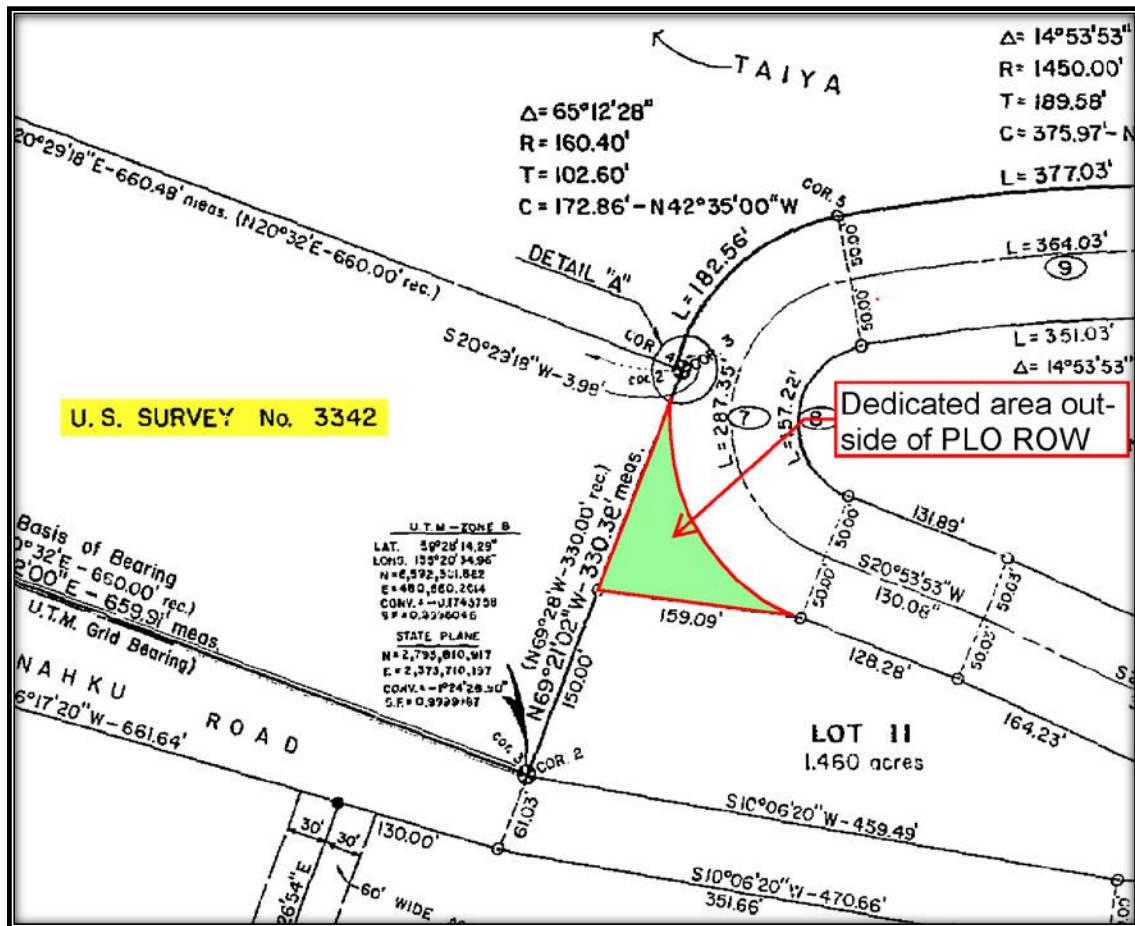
Plat 80-1 MP 4.3 Dyea Road
